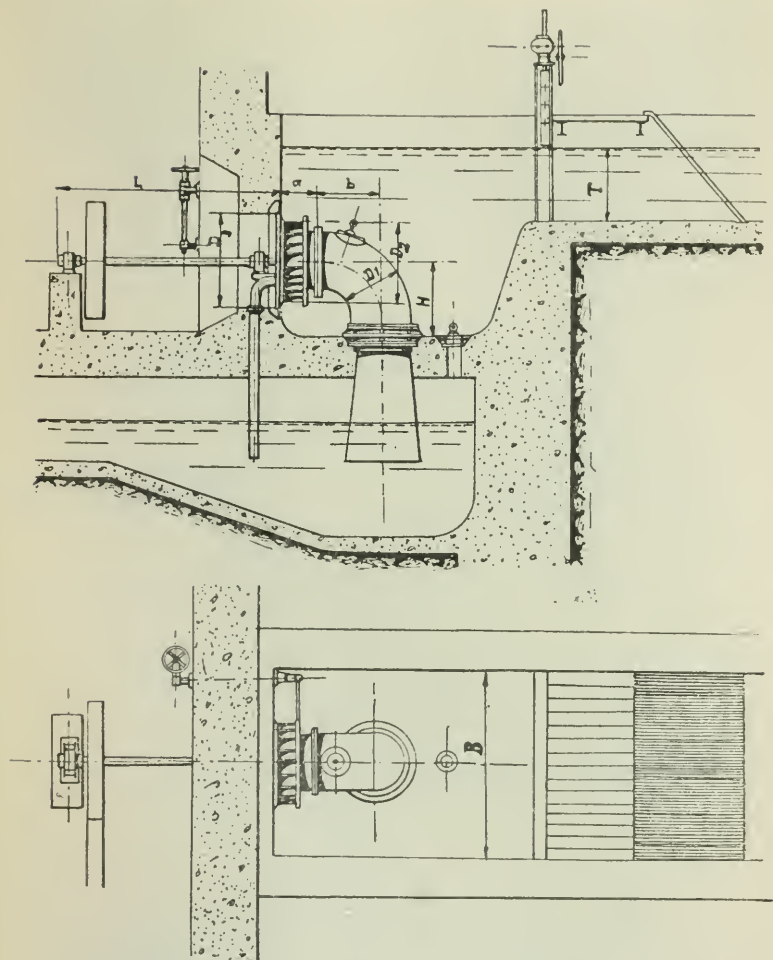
SINGLE FRANCIS TURBINE, WITH HORIZONTAL SHAFT AND IRON SUCTION TUBE.
